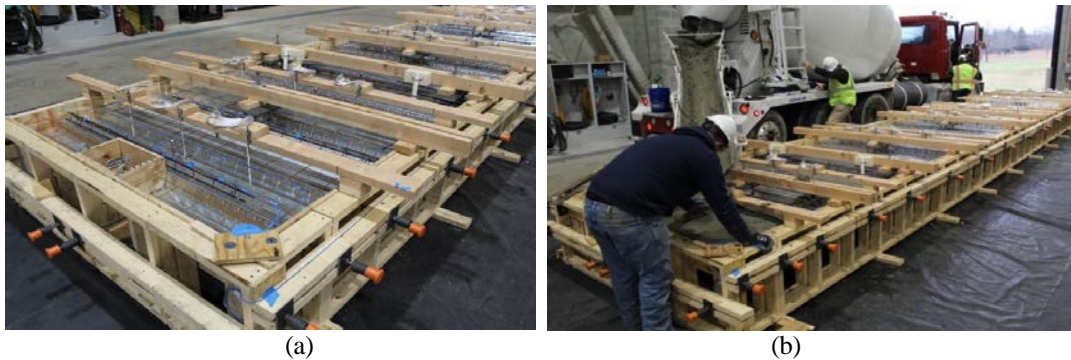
Photograph of the specimen: (a) before concrete placement; (b) during concrete placement.
